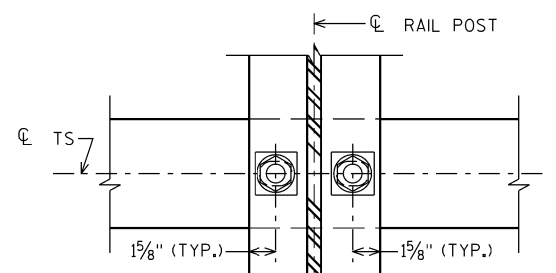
DETAIL AT END POST THRIE BEAM RAIL ATTACHMENT
